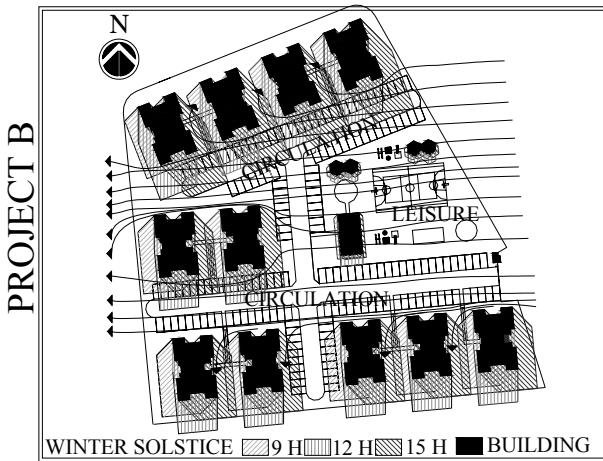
Shading and ventilation in the winter solstice day in house-building B.
